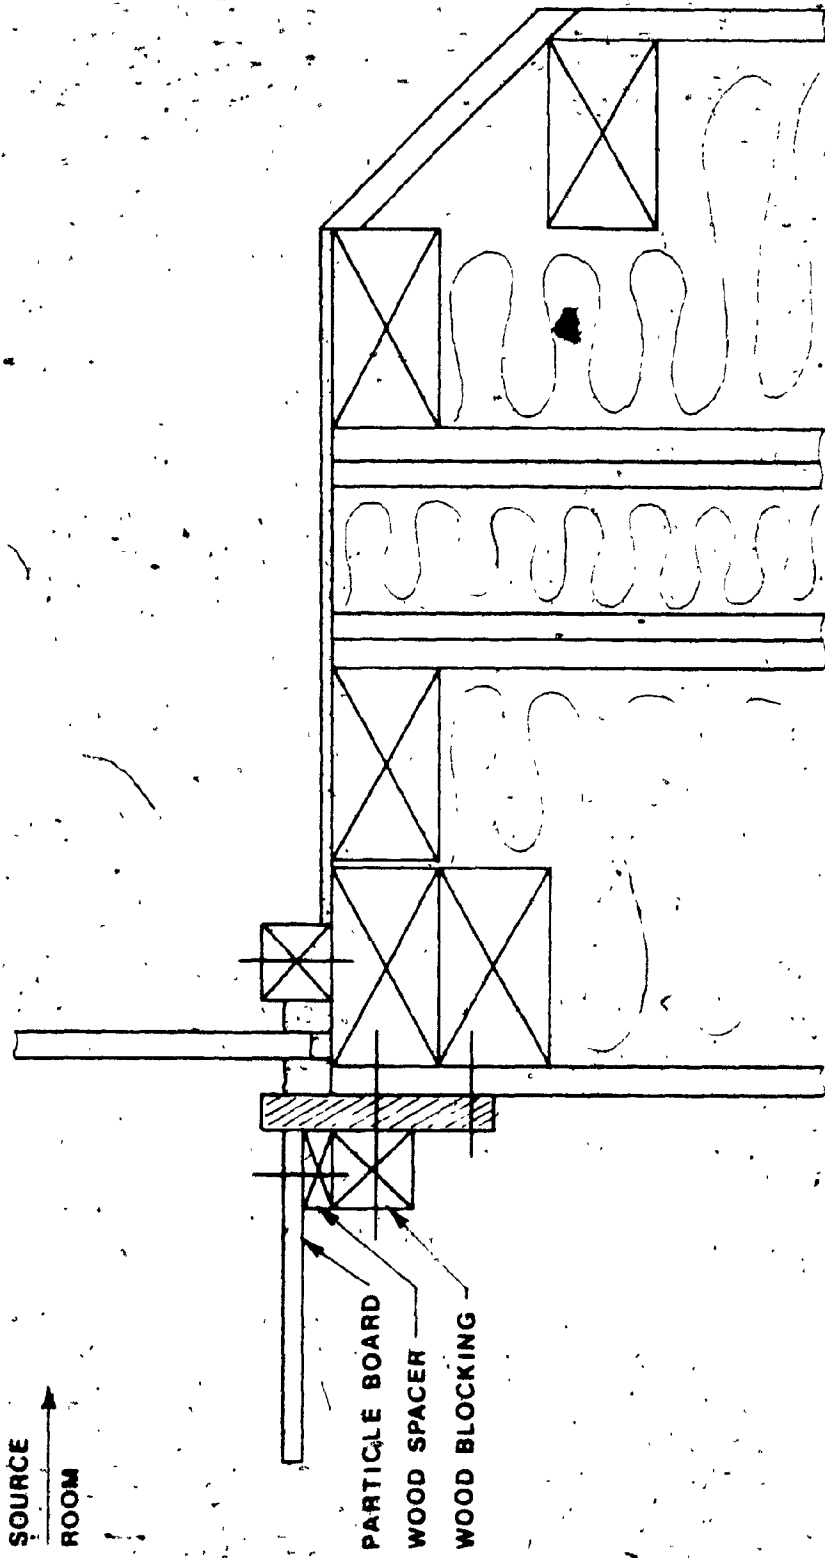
Mounting of Test Panel on Filler Wall With SH
